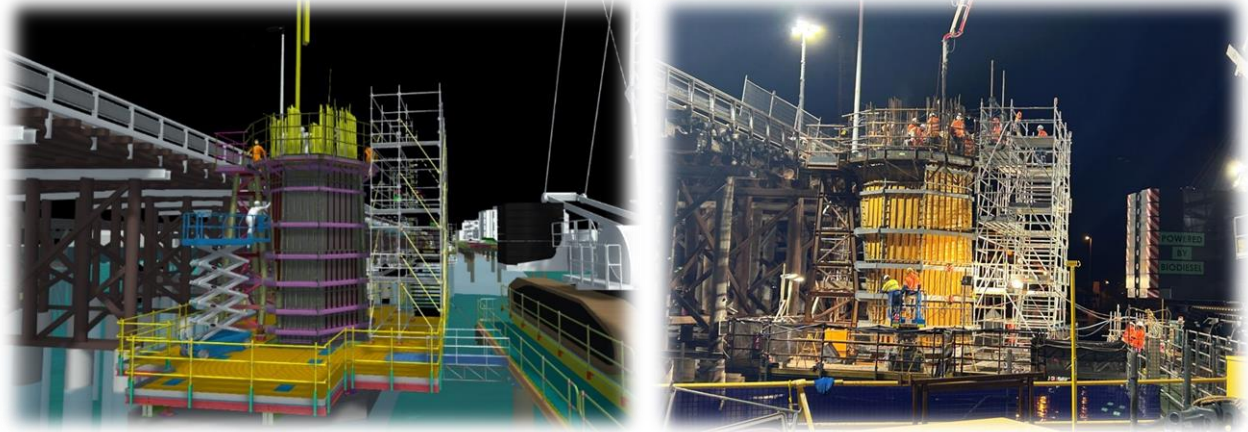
Digital image and corresponding photo of South-East lower tower installation
